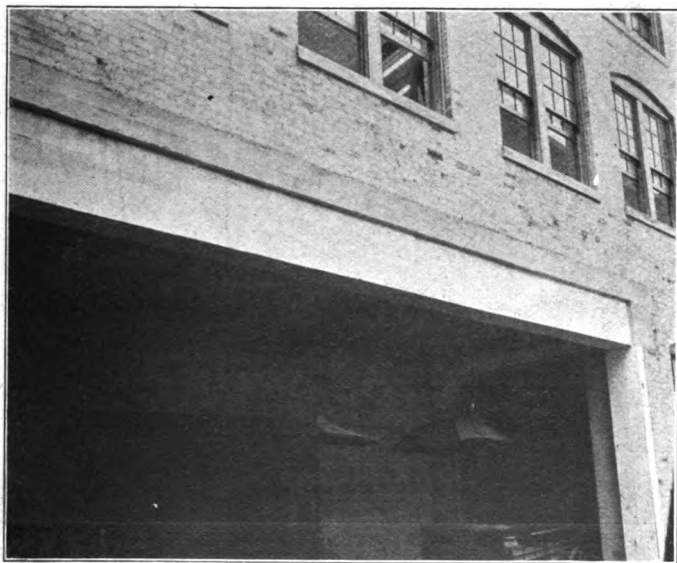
Lintel of 33 feet span, supporting a wall 60 feet high with several floors. J. H. Day & Co.'s Foundry, Cincinnati, O.
